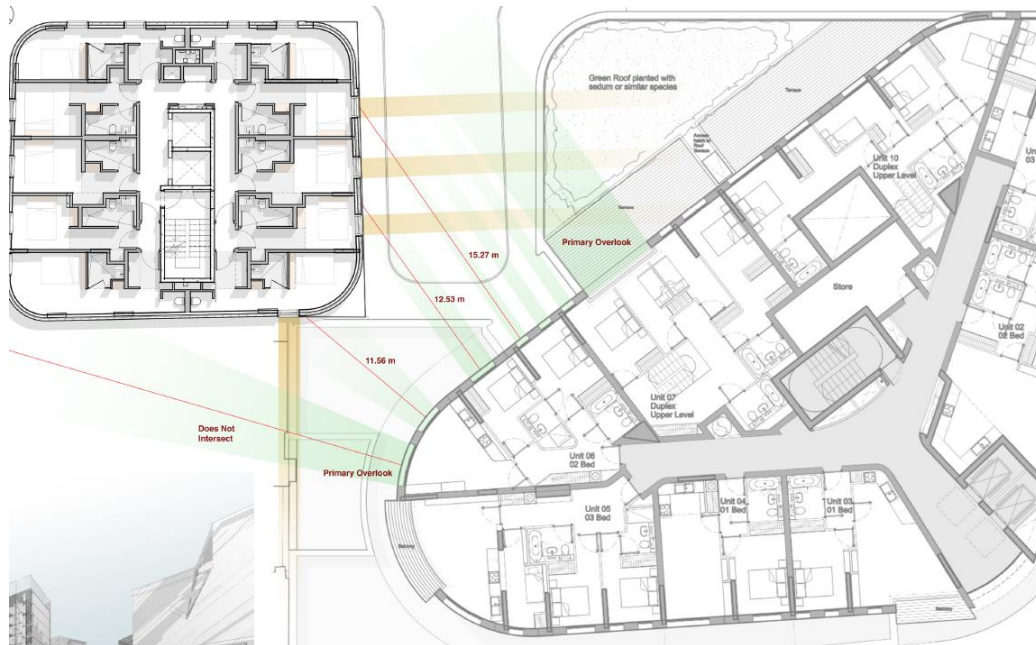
Plan showing relationship between scheme upper floor plan and floors within the tall building of Altitude
